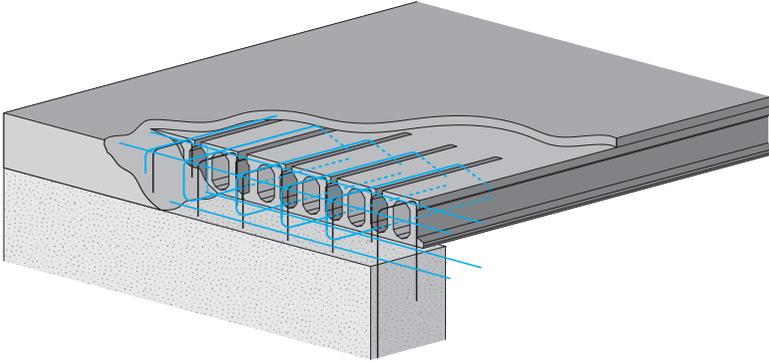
Connection between hollow core floor and retaining wall, with fixed end.
